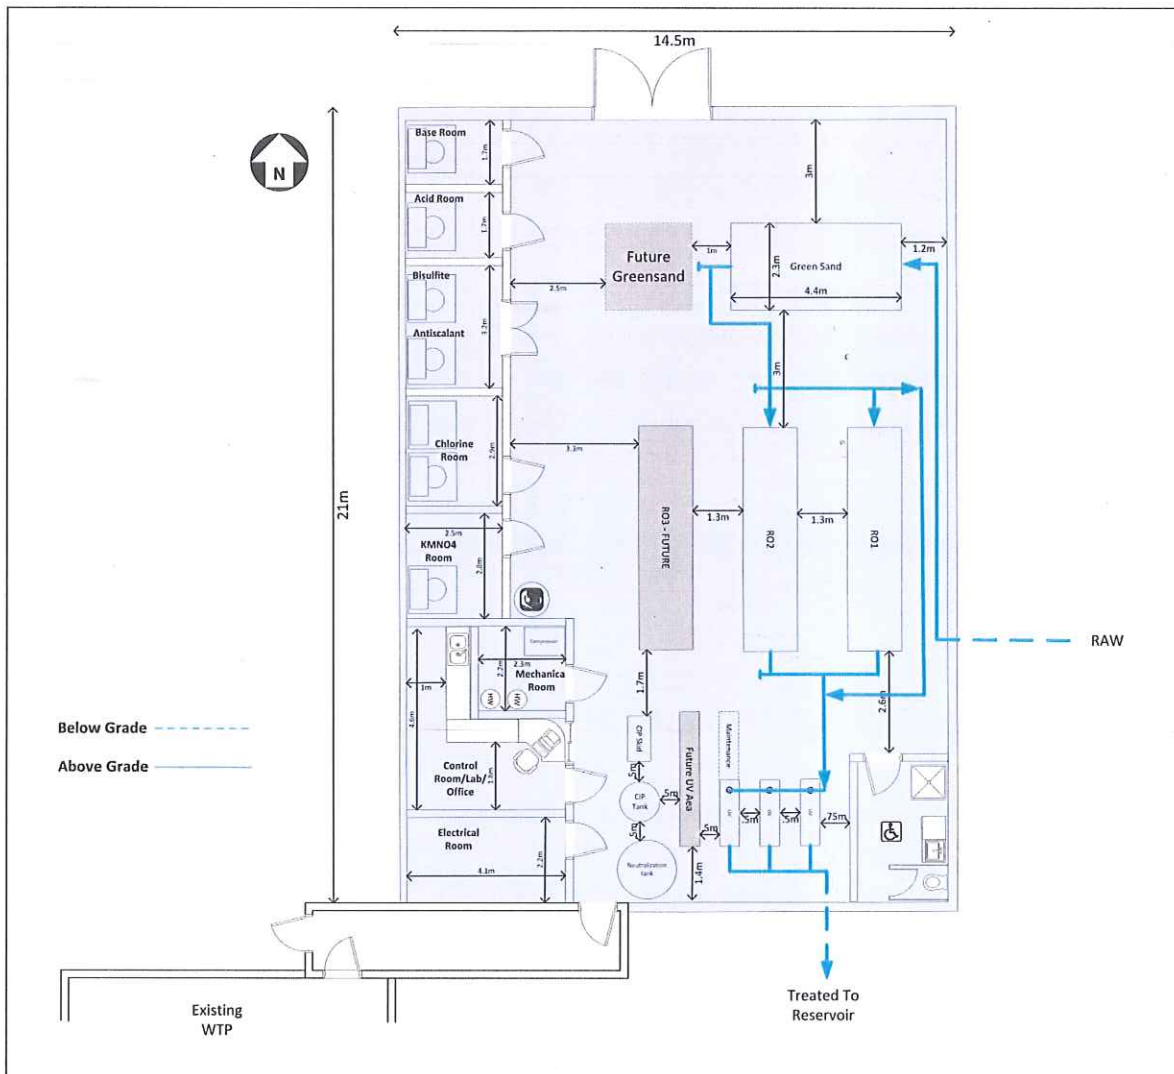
and ES.6 show layouts for Options 1 and 2, including the connection vestibule to the existing building. These layouts were used as basis to obtain preliminary (pre-engineered) building and mechanical equipment (i.e., HVAC and plumbing) costs. During detailed design the layouts will be improved with input from the architect.
